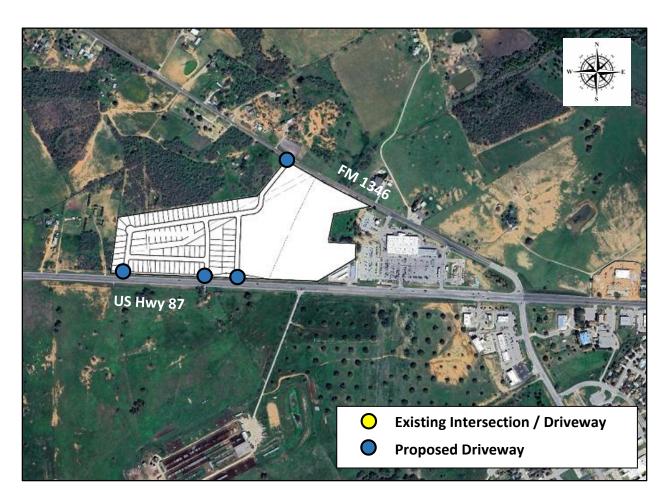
Existing and Proposed Access Driveways for the NP Homes
